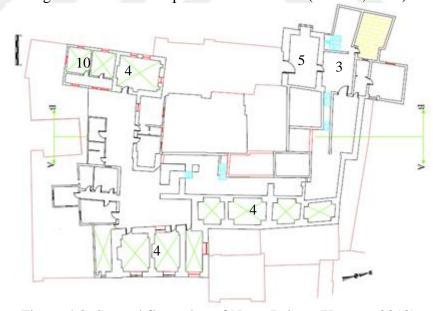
Second floor plan of Nemr Palace (Kanaan, 2010)
